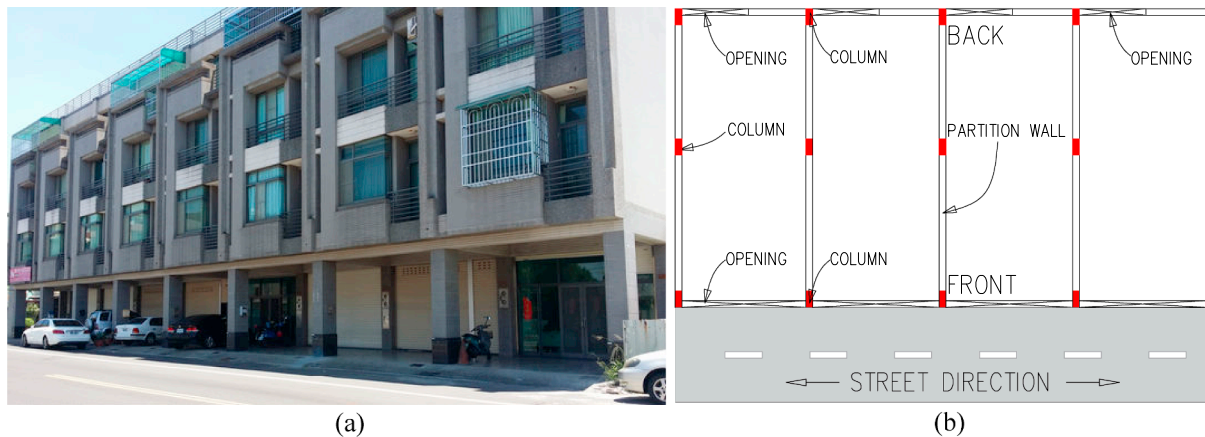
(a) Typical row houses in Taiwan; and (b) plan view of the first story of typical row houses.
